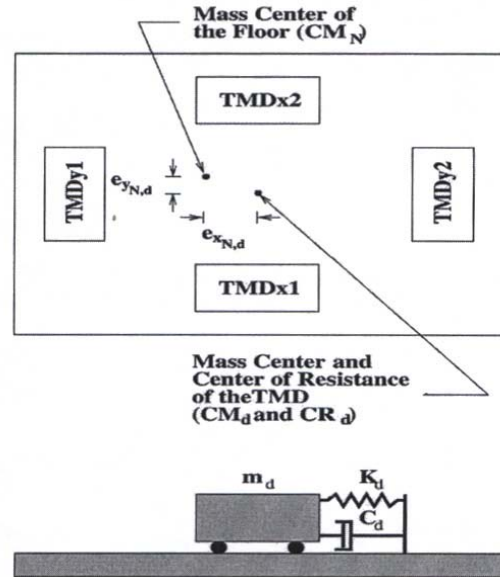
Suggested Arrangement on (TMD) on the last floor of Building (Ahlawat and Ramaswamy (2003))
